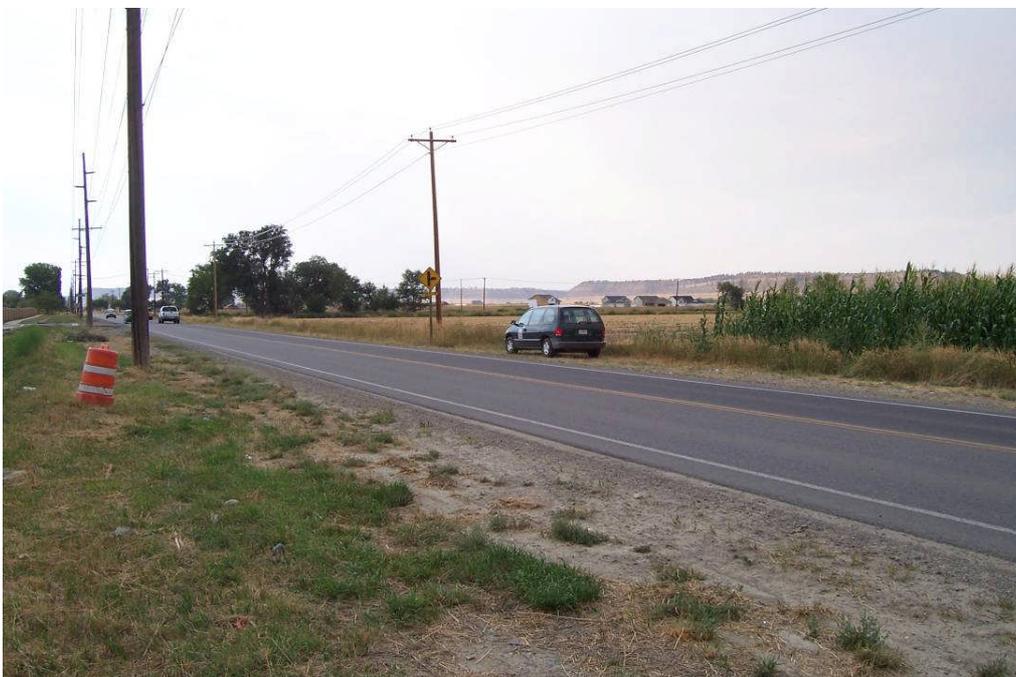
View northwest from Grand across the subject property. Cottonwood Grove Subdivision is in the far west portion of the photo, north of the planning van.
